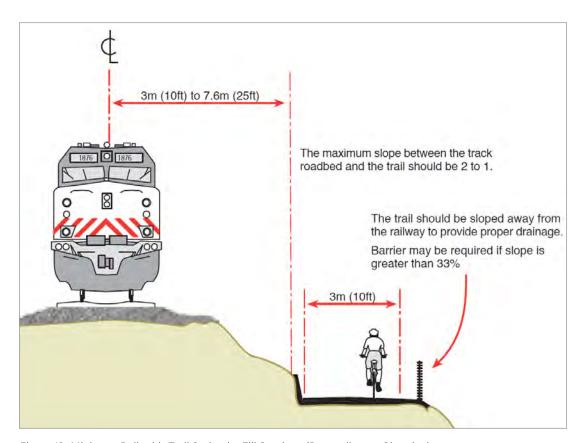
Minimum Rail-with-Trail Setback—Fill Sections (Depending on Situation)
